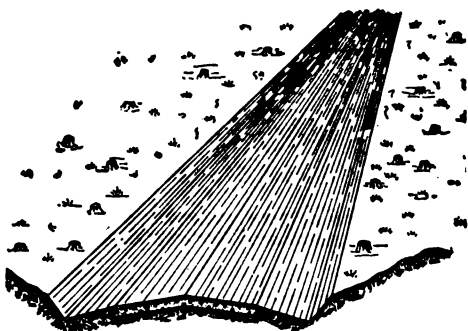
Cross section of a road showing crown, ditches and relative location of foundation and surfacing.
